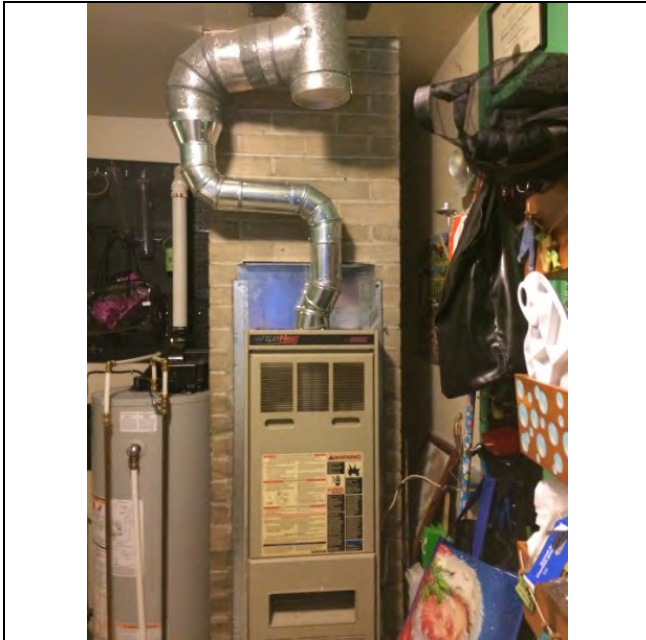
Presumed asbestos-containing brick mortar was observed on a chimney exhaust in the laundry room.
